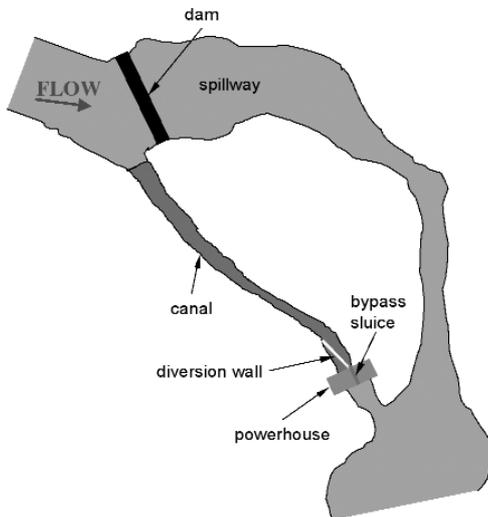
Site plan, Bellows Falls Dam, Connecticut River, Vermont, USA.
